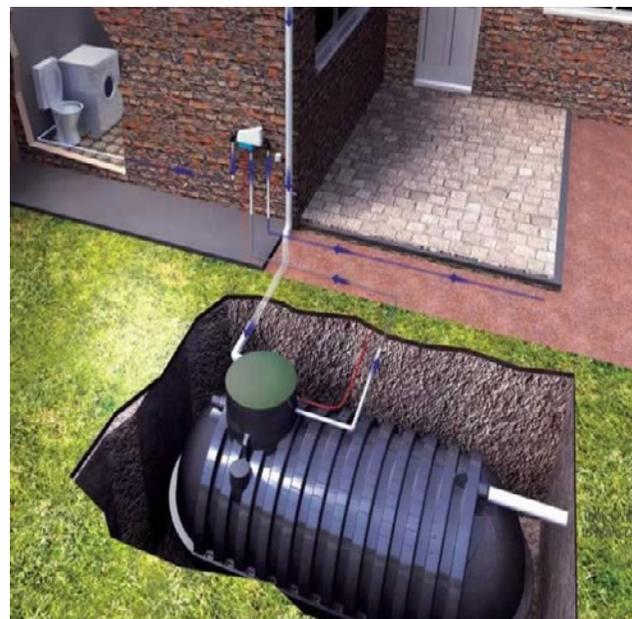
Example of an underground water tank in relationship with the building (Source: <https://handymantips.org/about-underground-water-tanks/>)
